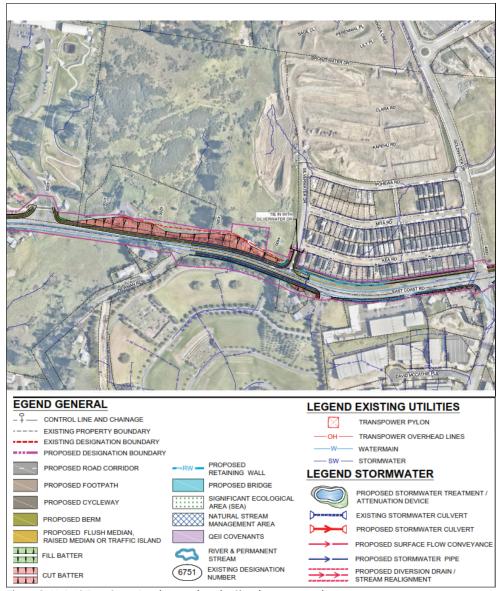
NoR 13 East Coast Road Upgrade – the Site shown as a red star
